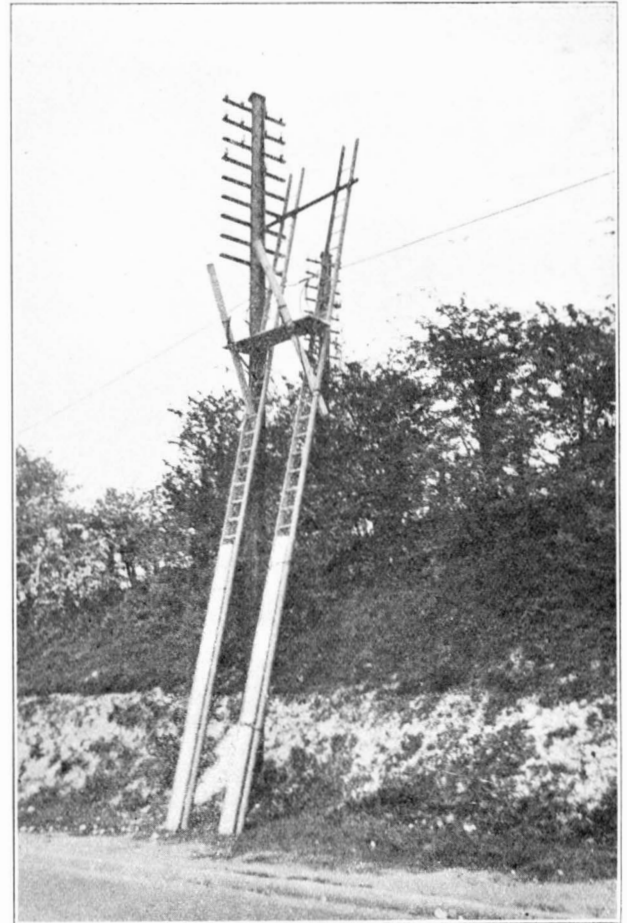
ERECTION OF JOINTING PLATFORM.
